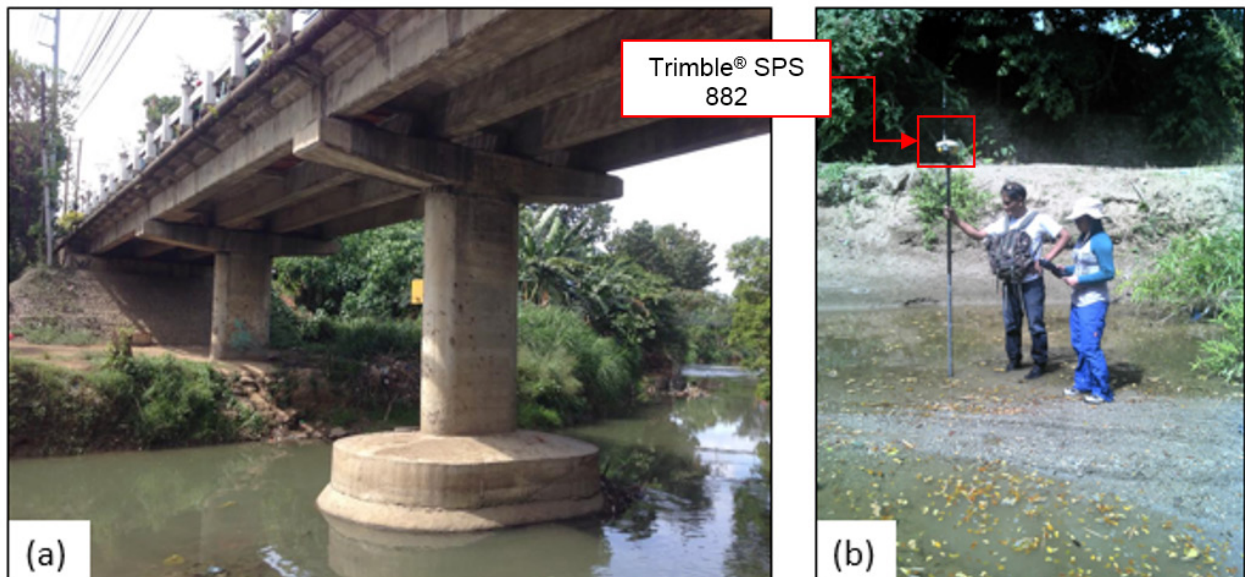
(a) Tumaga Bridge, and (b) cross-section survey at Tumaga Bridge, Brgy. Tumaga, Zamboanga City
